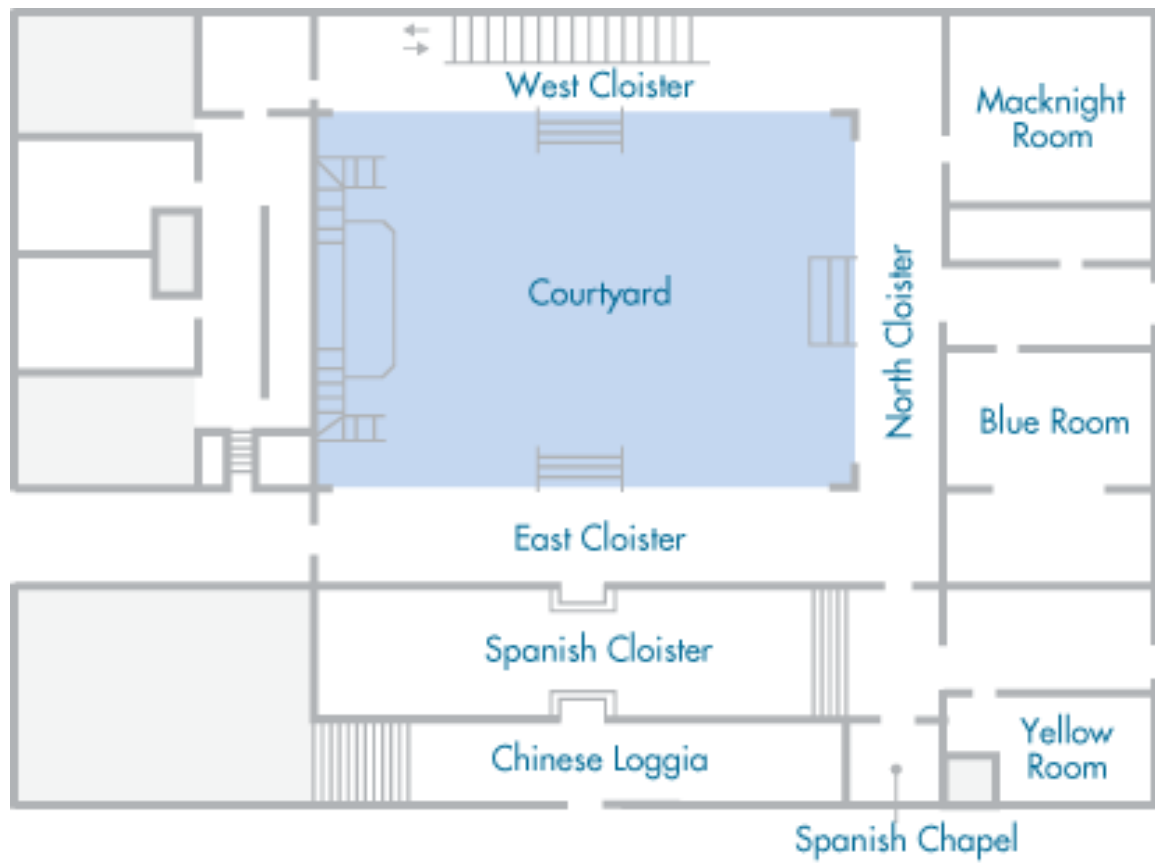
First floor plan, 2014, Gardnermuseum.org.
